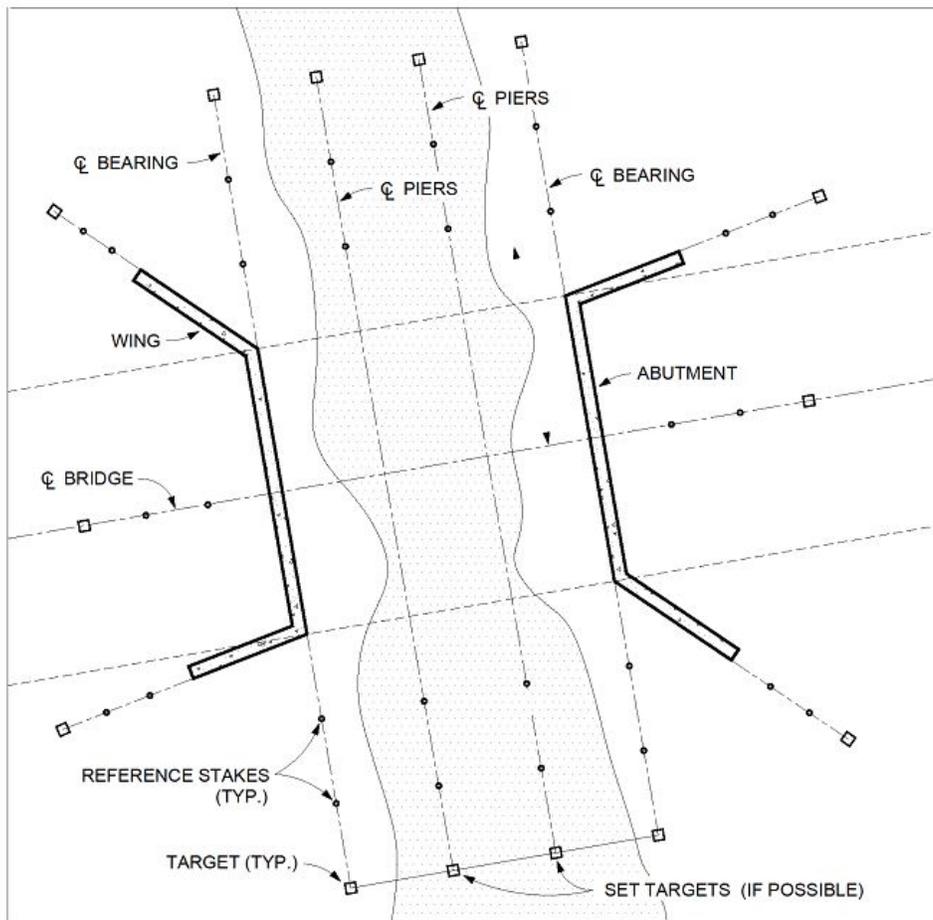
6: Typical Multi-Span Bridge Layout (River Crossing)
